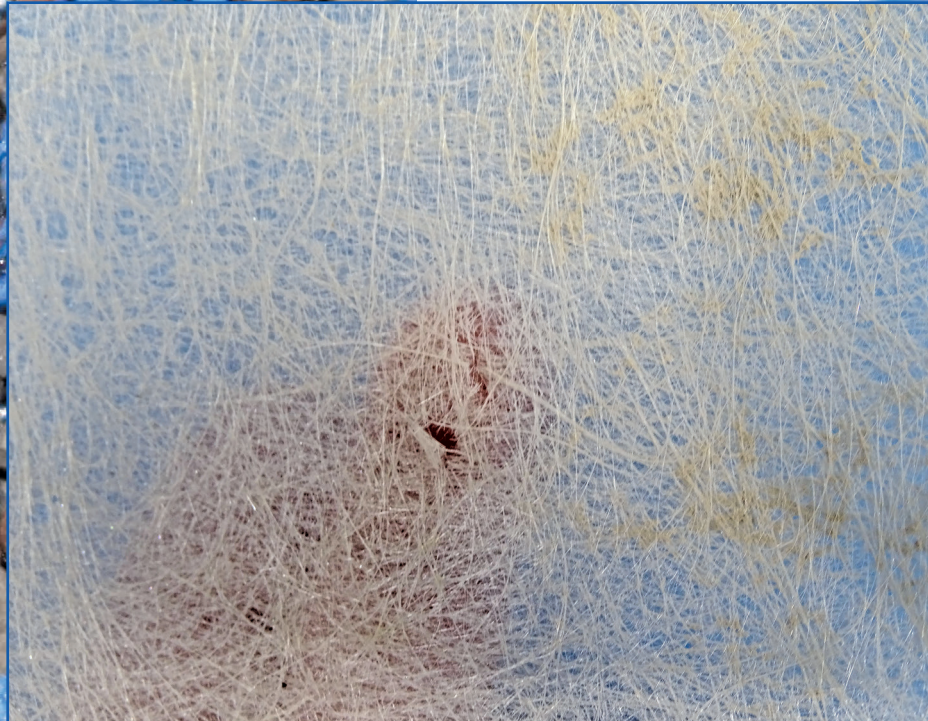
Fracture visible on bottom of shingle at impact shown in Figure 11.
